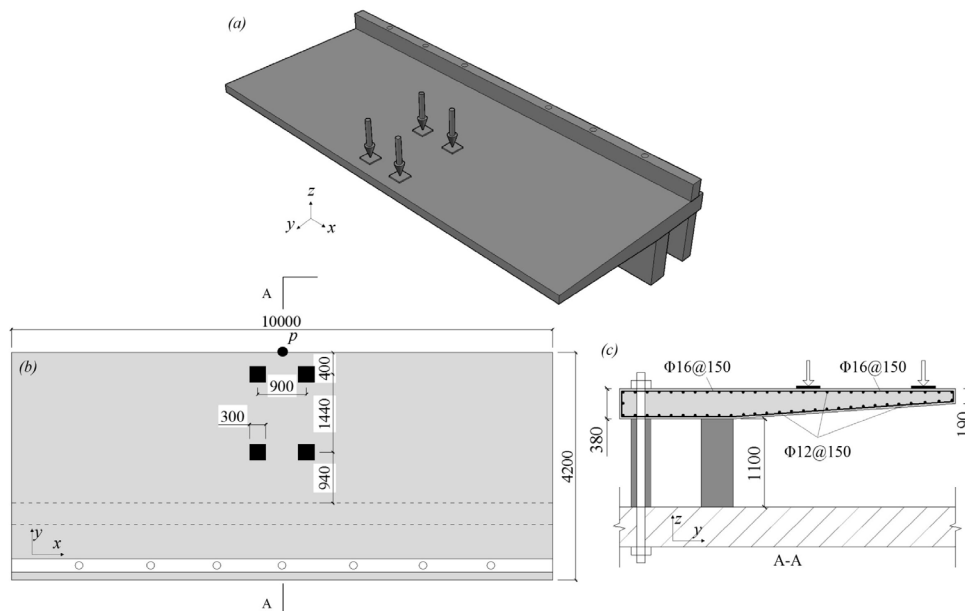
The experiment set-up, dimensions and reinforcement layout for cantilever slab DR1-a, adapted from (Vaz Rodrigues, 2007); (a) isometric view (b) top view and (c) cross-section; all dimensions are in mm. From Plos *et al.* (2017).
